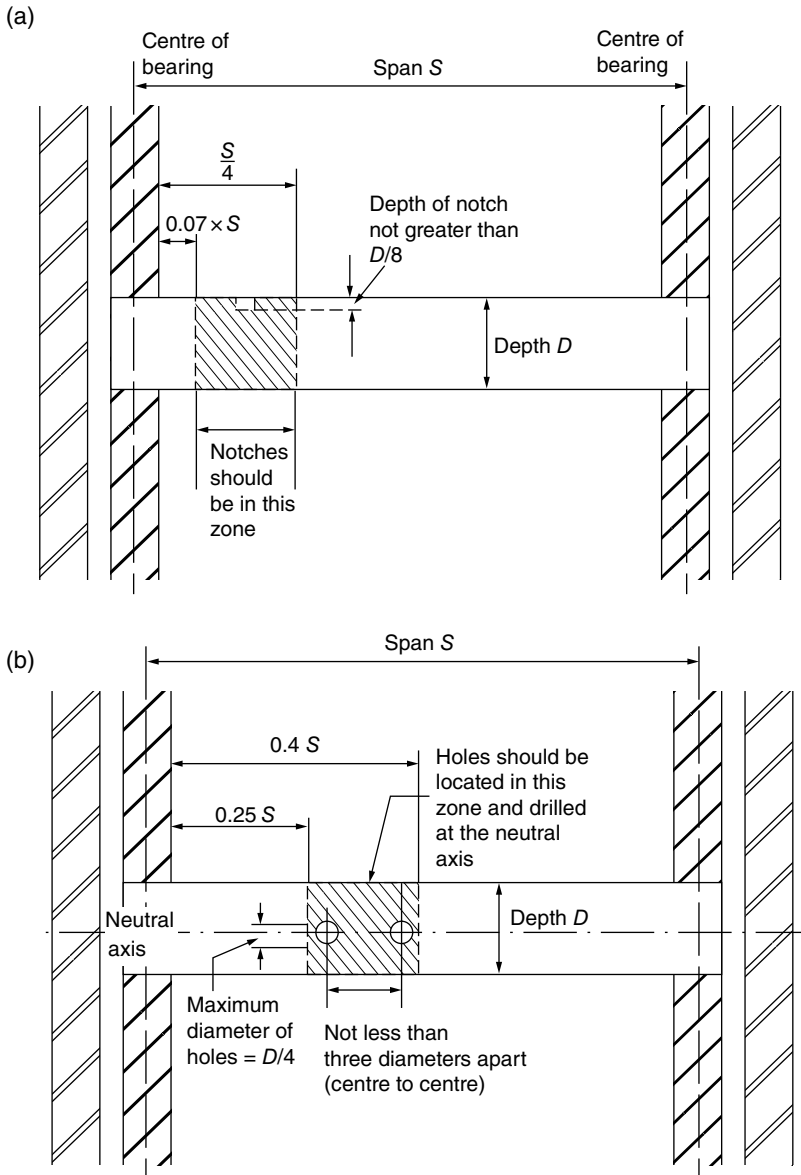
Notches (a) and holes (b) in floor and roof joists.
